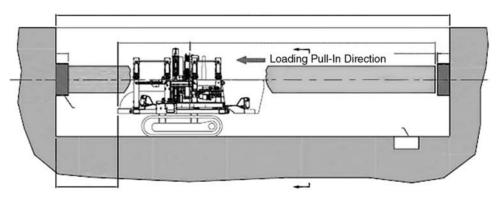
Sliplining installation of butt-fused PVC segmental approach.
